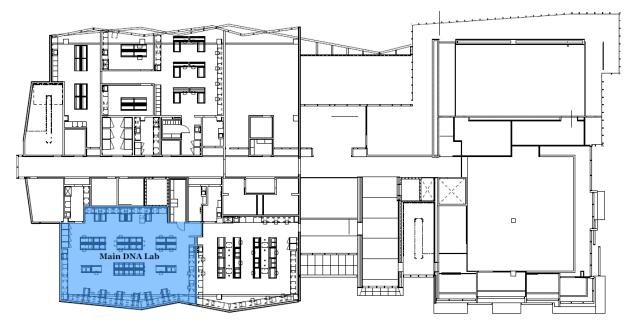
| Second Floor Plan Main DNA Lab Location
